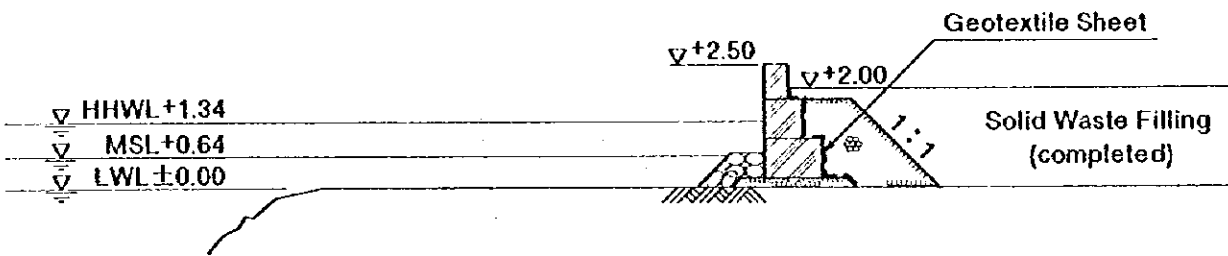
Proposed Seawall Construction Plan in Thilafushi Island
